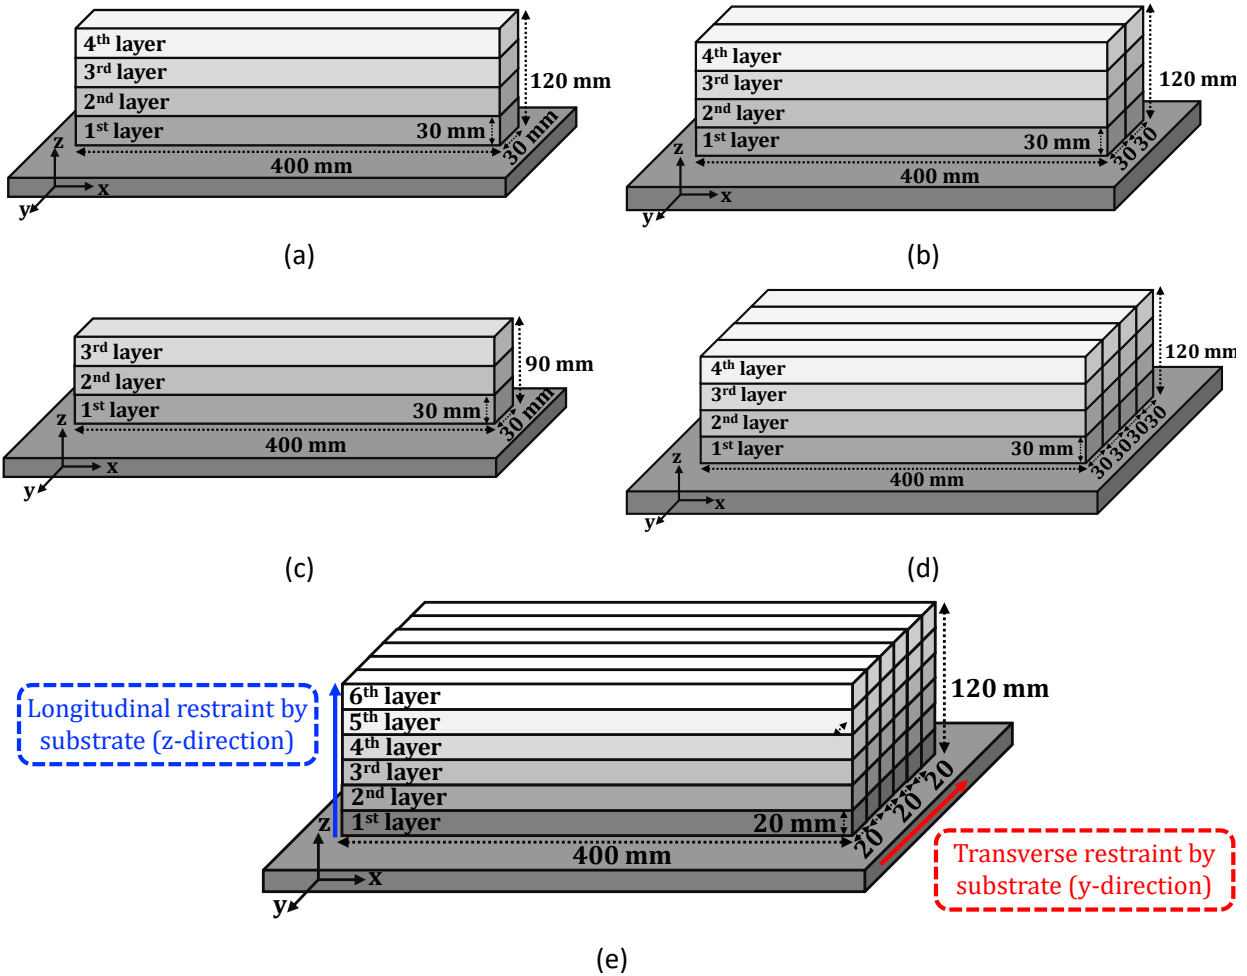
Geometries of 3D printed wall specimens used for early-age shrinkage evaluation: (a) single-filament wall (400 × 30 × 120 mm), (b) double-filament wall (400 × 60 × 120 mm), (c) single-filament wall of reduced height (400 × 30 × 90 mm), (d) four-filament thick wall (400 × 120 × 120 mm), and (e) six-filament thick wall with 20-mm square filaments (400 × 120 × 120 mm).
